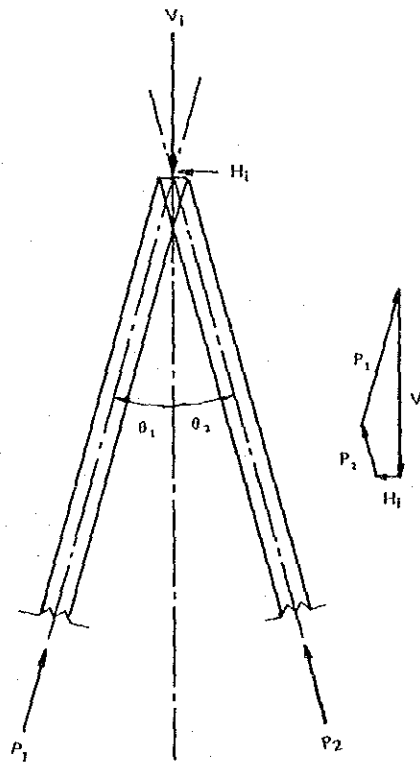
Axial Force Acting on the Coupled Batter Piles
